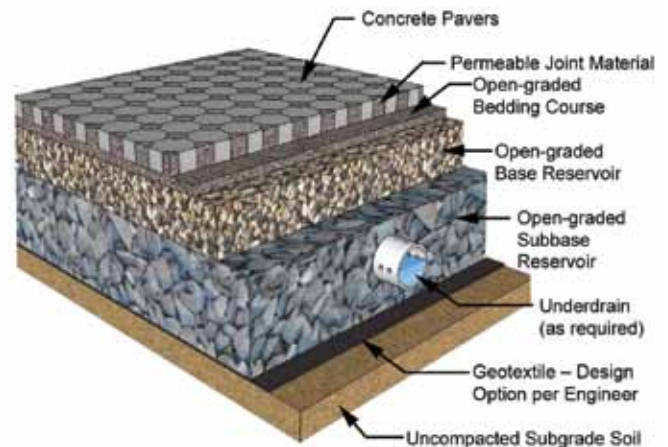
Cross section of permeable interlocking concrete pavement (PICP)
